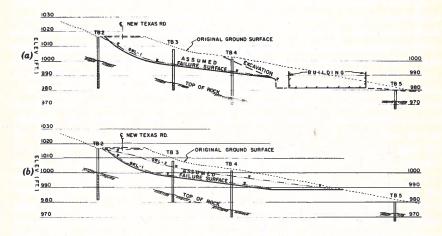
Failure Conditions Assumed for Analysis: (a) after Excavation; (b) before Excavation
